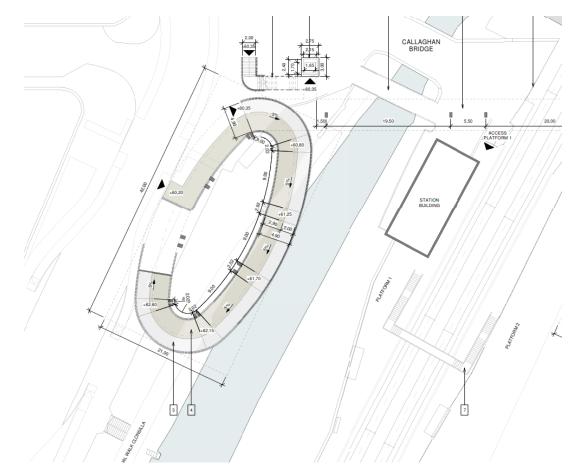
Clonsilla footbridge proposal. No damming and dewatering of the Canal is required.
